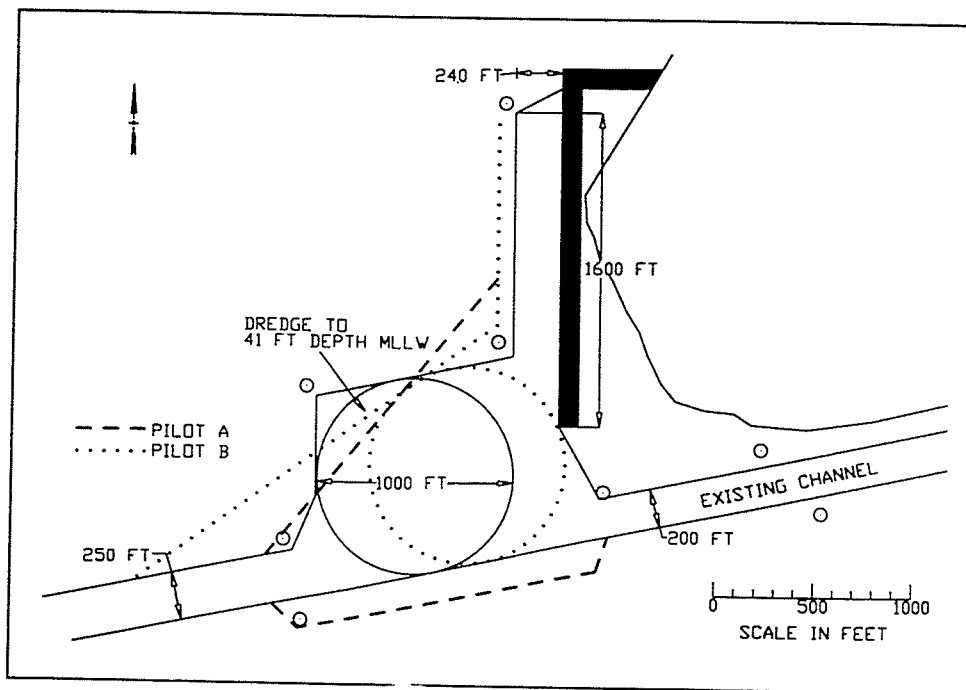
Pilot suggestions for Plan 2 turning basin configuration
